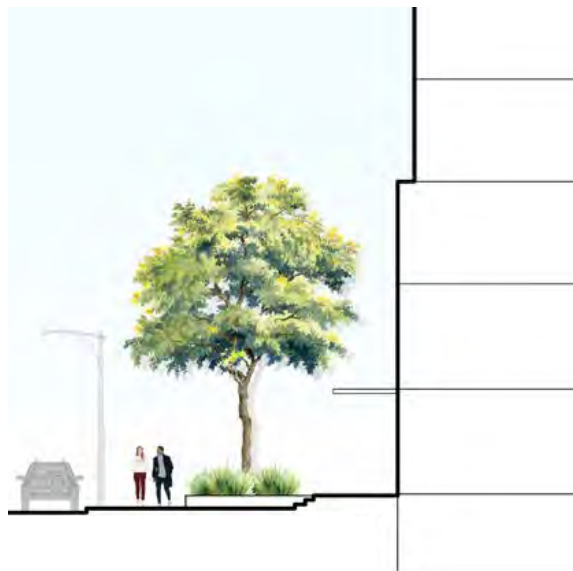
Building 2D frontage on Huron Lane (Section 1)
